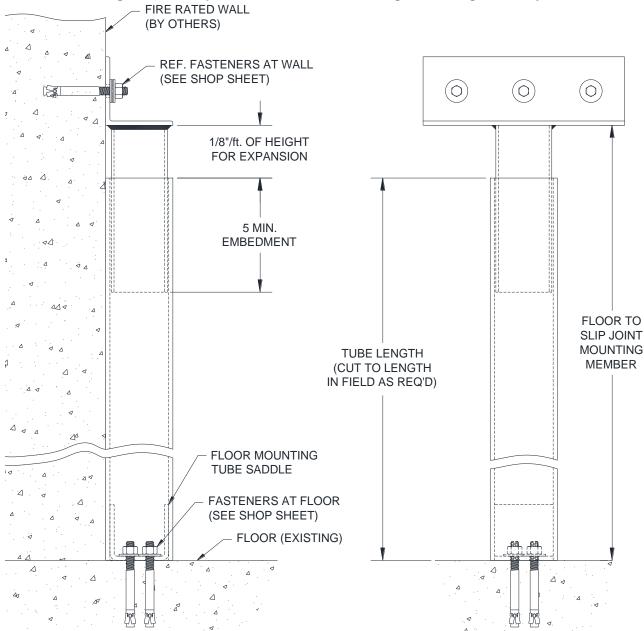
Slip Joint - Floor to Wall with Angle Mounting Assembly
